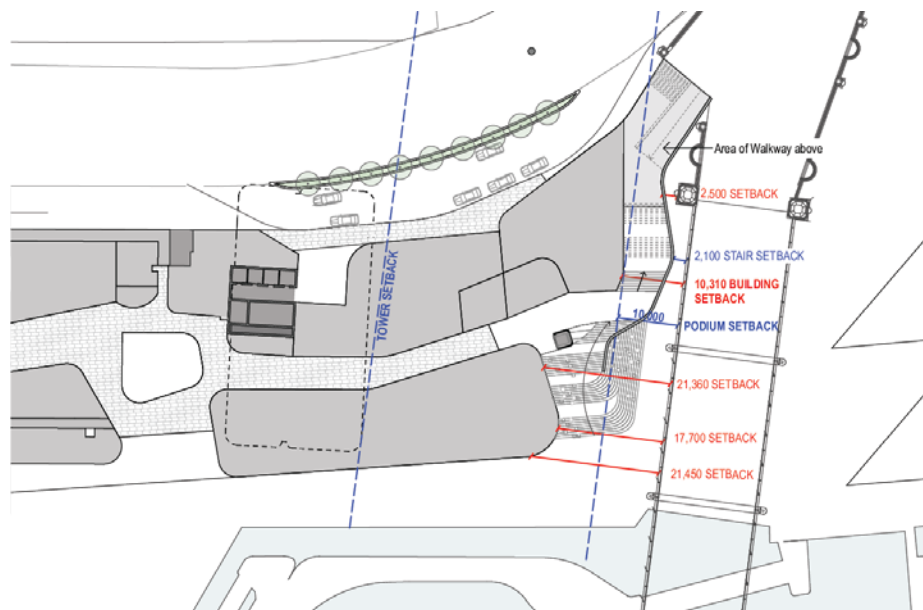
Indicative proposal setbacks and terracing from Pymont Bridge
